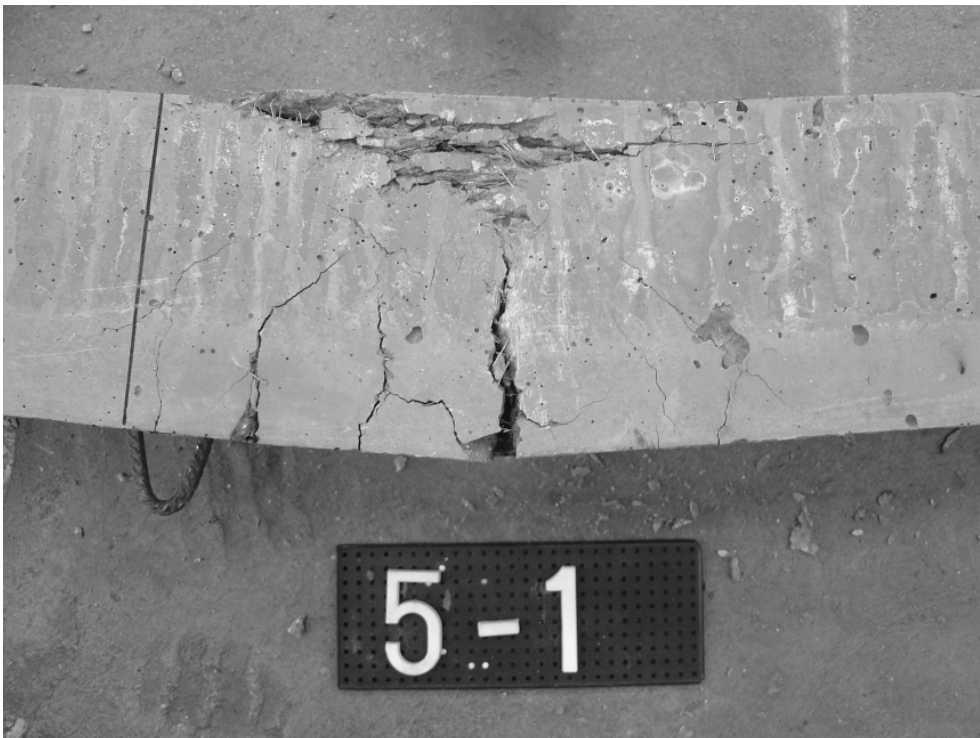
Column tested at DTU with 120x120 mm cross-section, 2% fibres, length 3898 mm, reinforcement 4Y16, maximum test load 570 kN.
